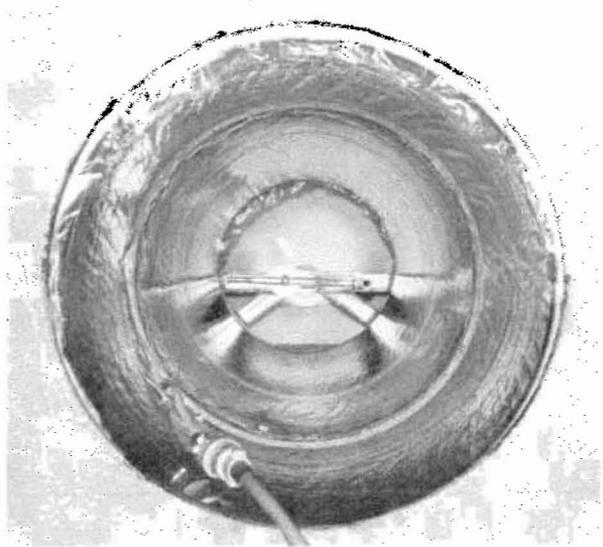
18-inch (46-cm) diameter FRP pipe in soil container prior to loading (Test E). Photo P801-D-73865
